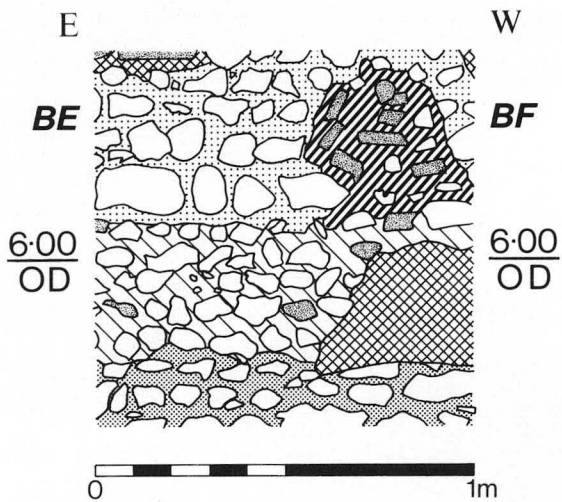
Period IV. Elevation of south aisle wall, c.AD 1400. BE–BF. Scale 1:20
